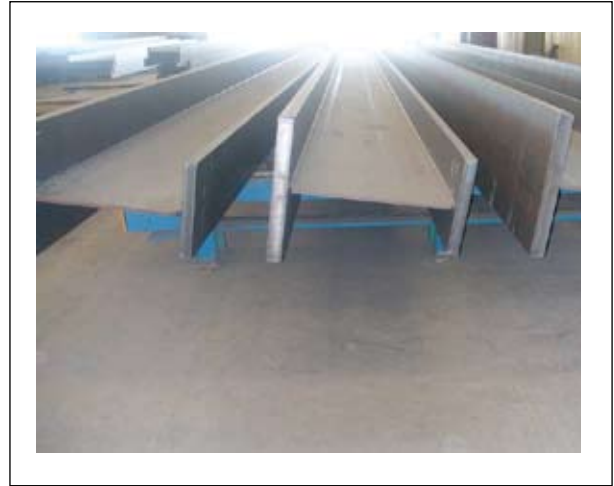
Asymmetric welded beams (Photo courtesy Brian Mahony)
